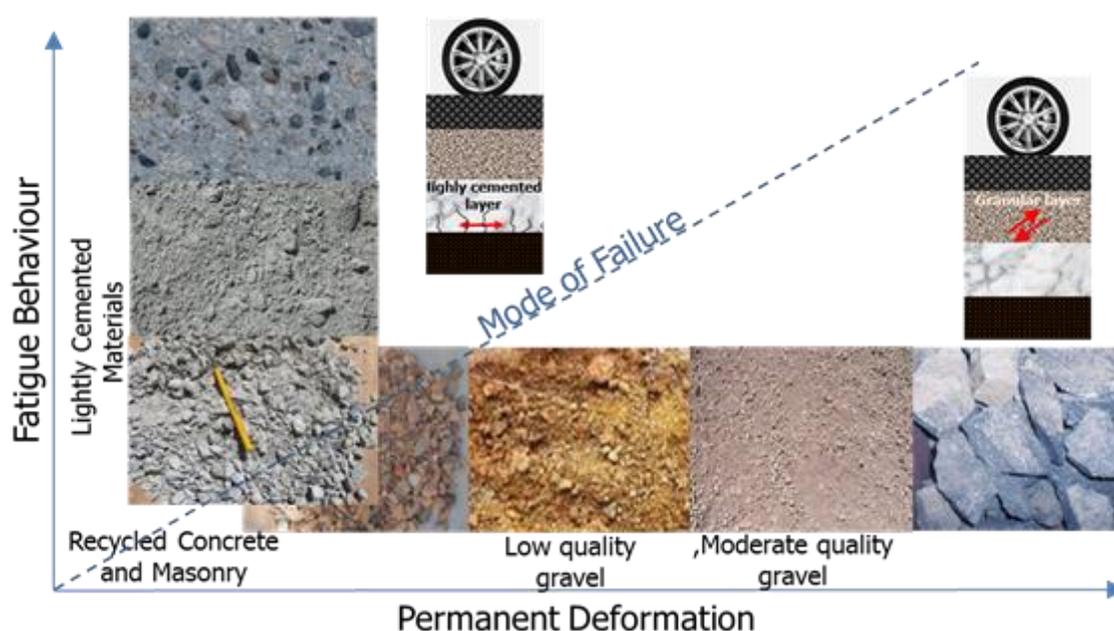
Typical Schematic Illustration on the Potential Modes of Failure for Recycled Concrete Aggregate in Pavement Layers (Rudman and Jenkins, 2015)
